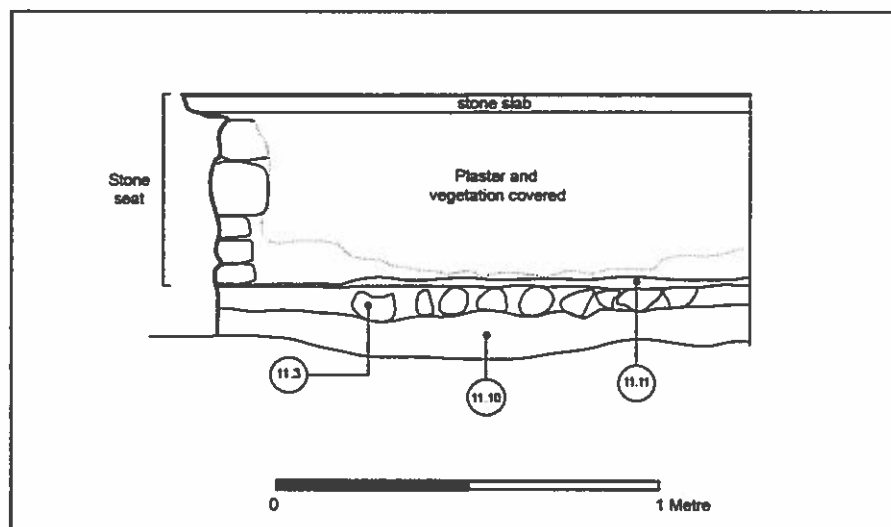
North-west facing section below stone seat after ground level reduction in Room 11.
